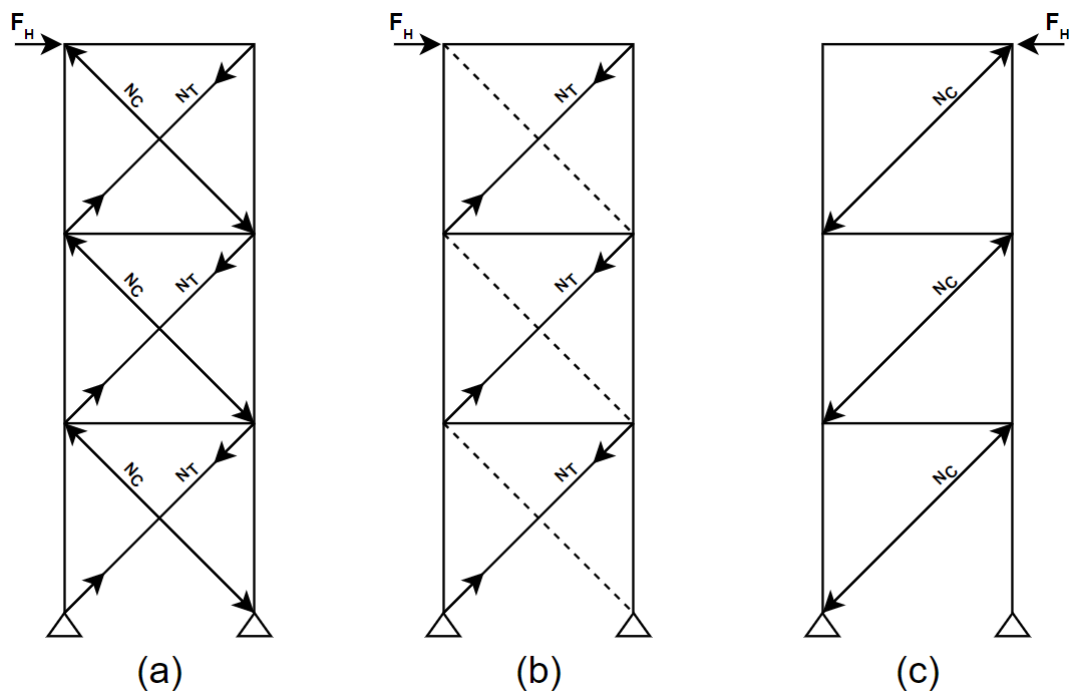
Cross- and Single-Member Vertical Brace Arrangements
